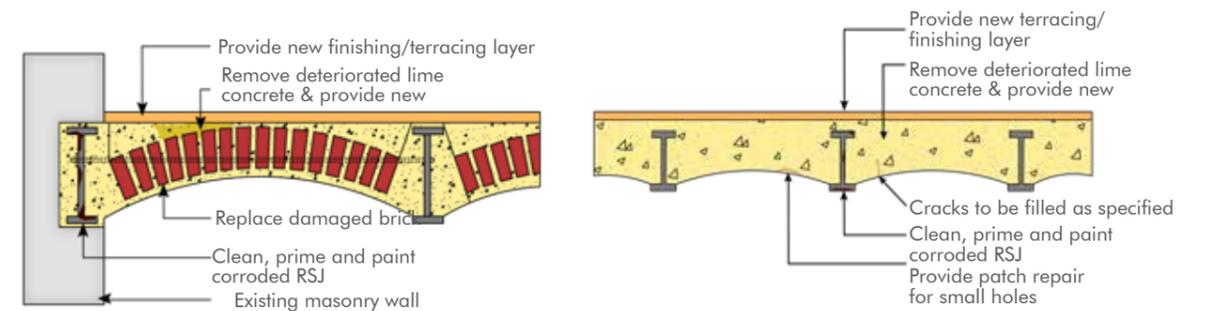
Detail of jack arch roofing with brick and without bricks. Source: IS: 2118-1980
